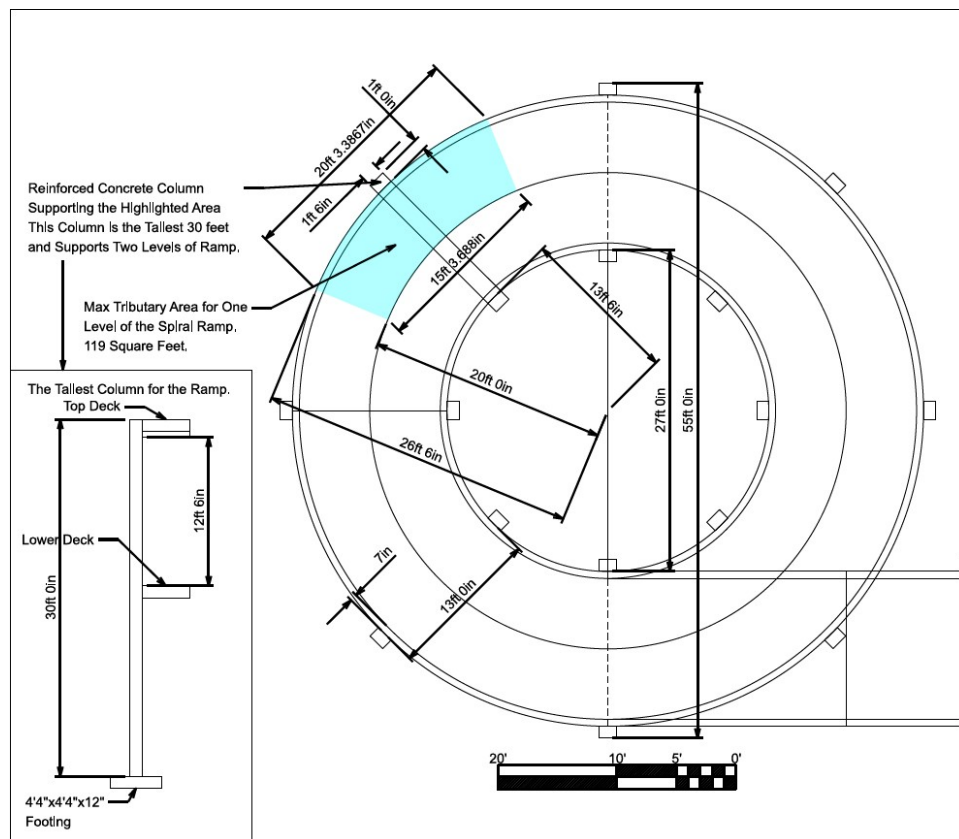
Spiral Ramp Concrete Column Calculation Drawings
